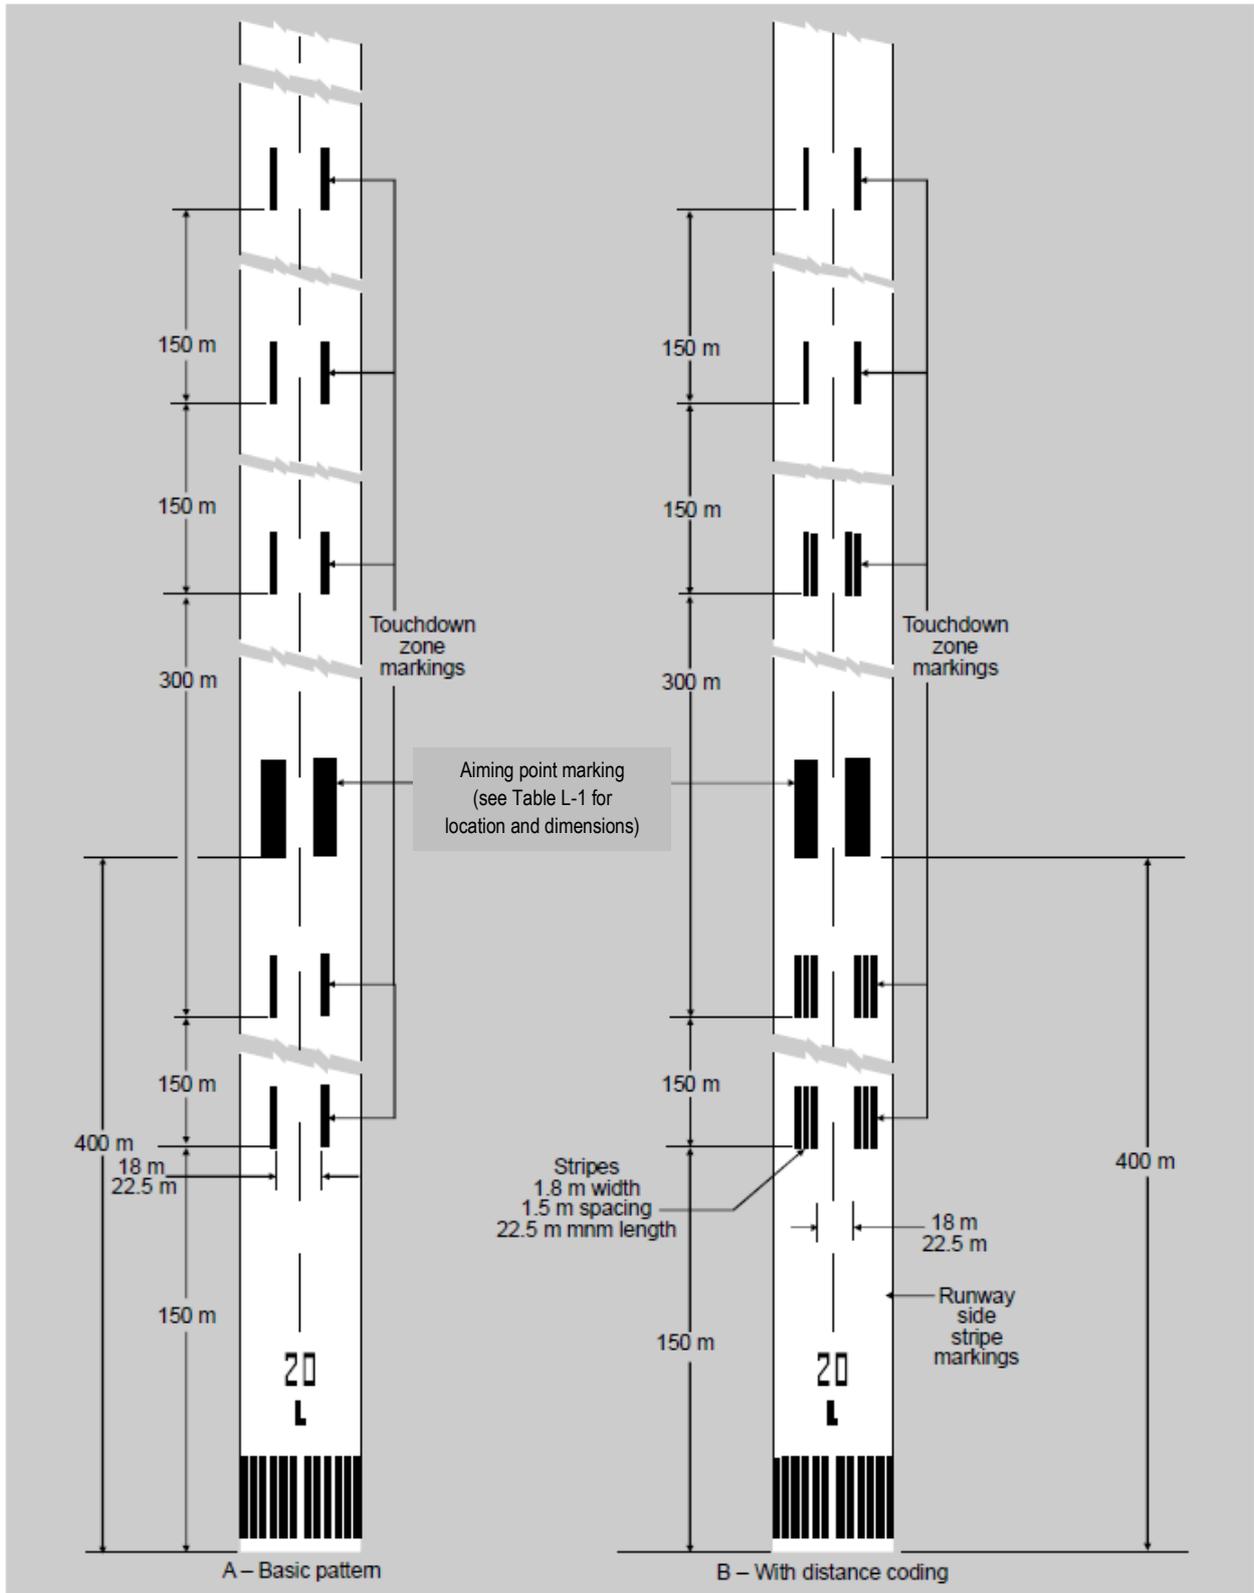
Aiming point and touchdown zone markings (illustrated for a runway with a length of 2 400 m or more)
